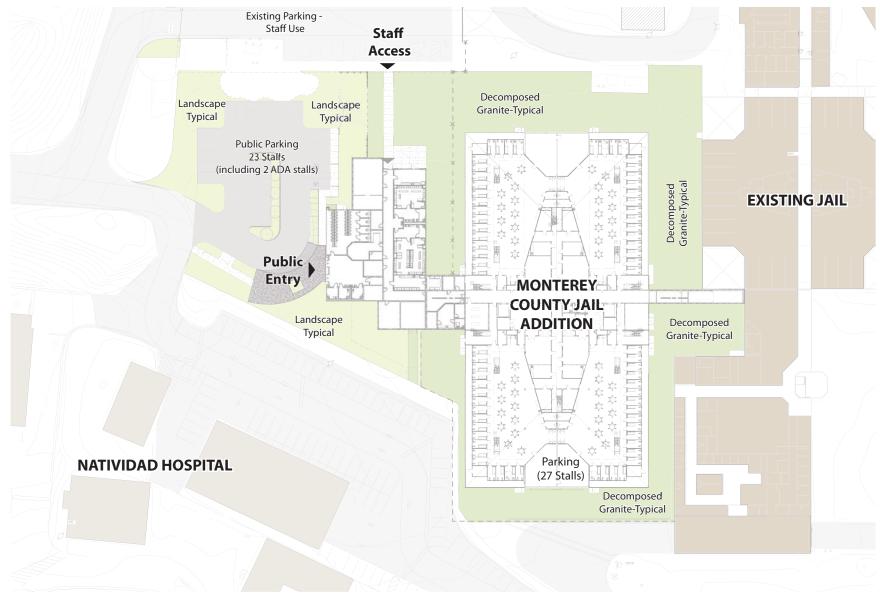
, Site Plan on page 2-15, and Figure 5, Site Plan – Aerial View on page 2-17 of the Draft EIR are revised to reflect current refinements to the project design including a small decrease in building footprint and re-orientation of the buildings on the project site as identified in the revised text above.
